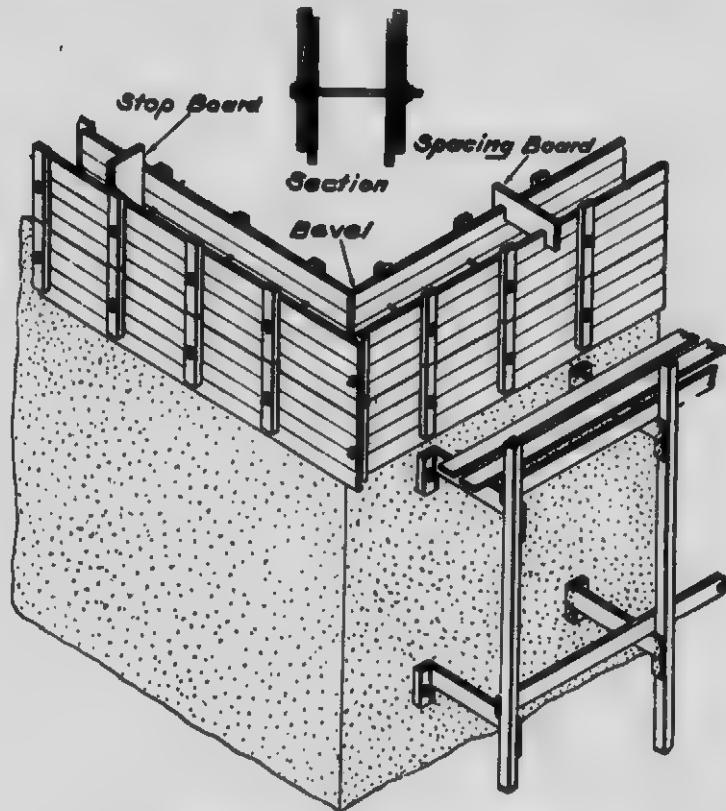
FORMS FOR CONSTRUCTION OF UPPER WALL.
